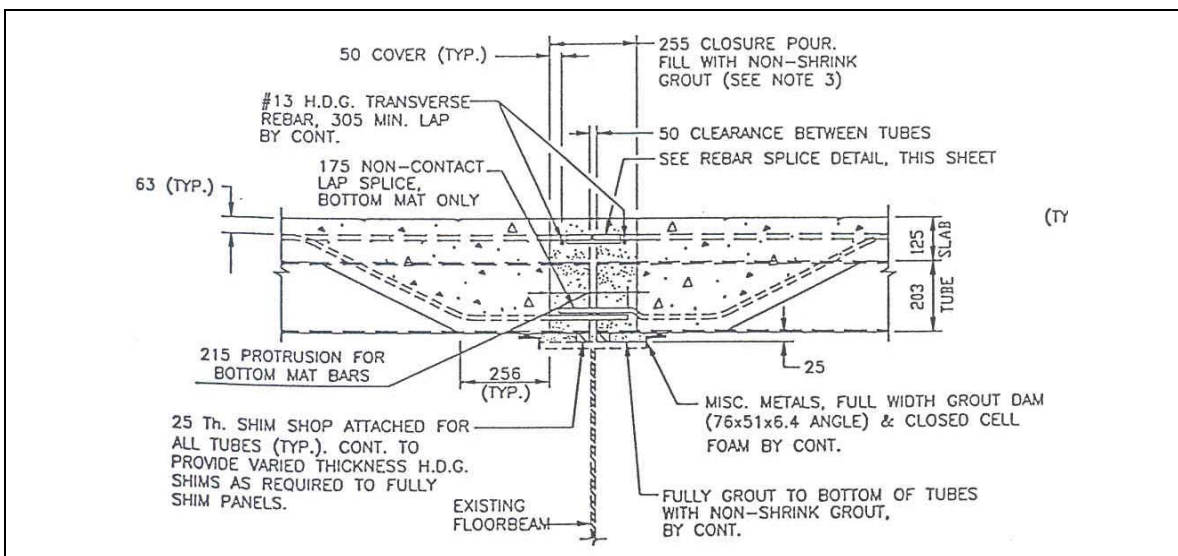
Typical joint section for bridge over Cascadilla Creek, Ithaca, NY (The Fort Miller Co., Inc., 2001)
